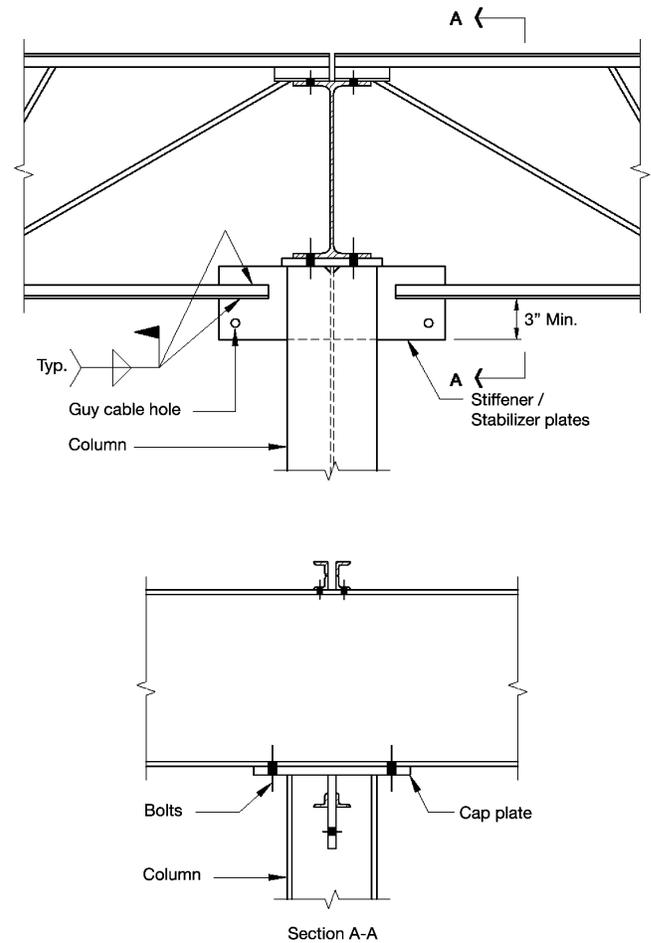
Strut joist with welded bottom chord and stabilizer plate.
